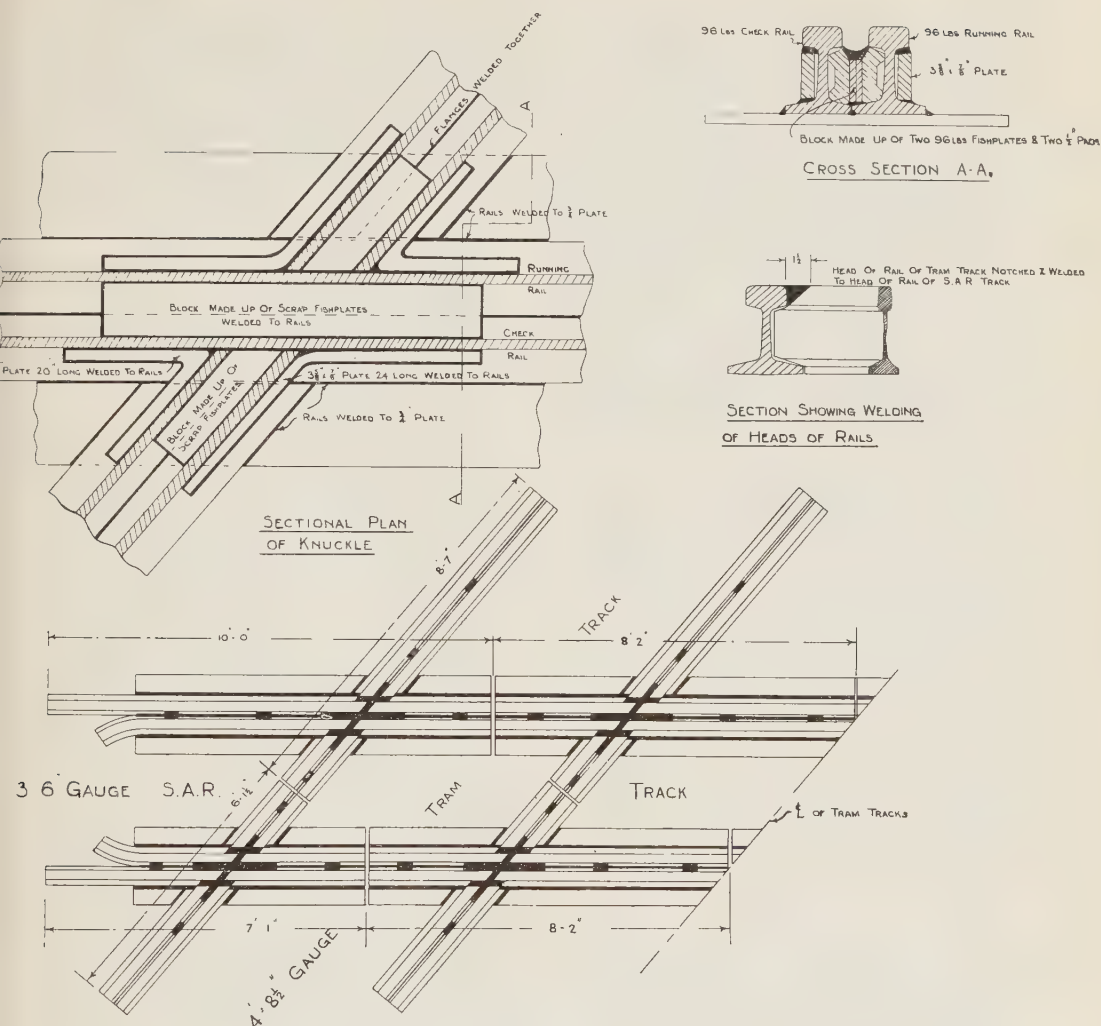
Diamond crossing fabricated by welding. — South African Railways and Harbours.
